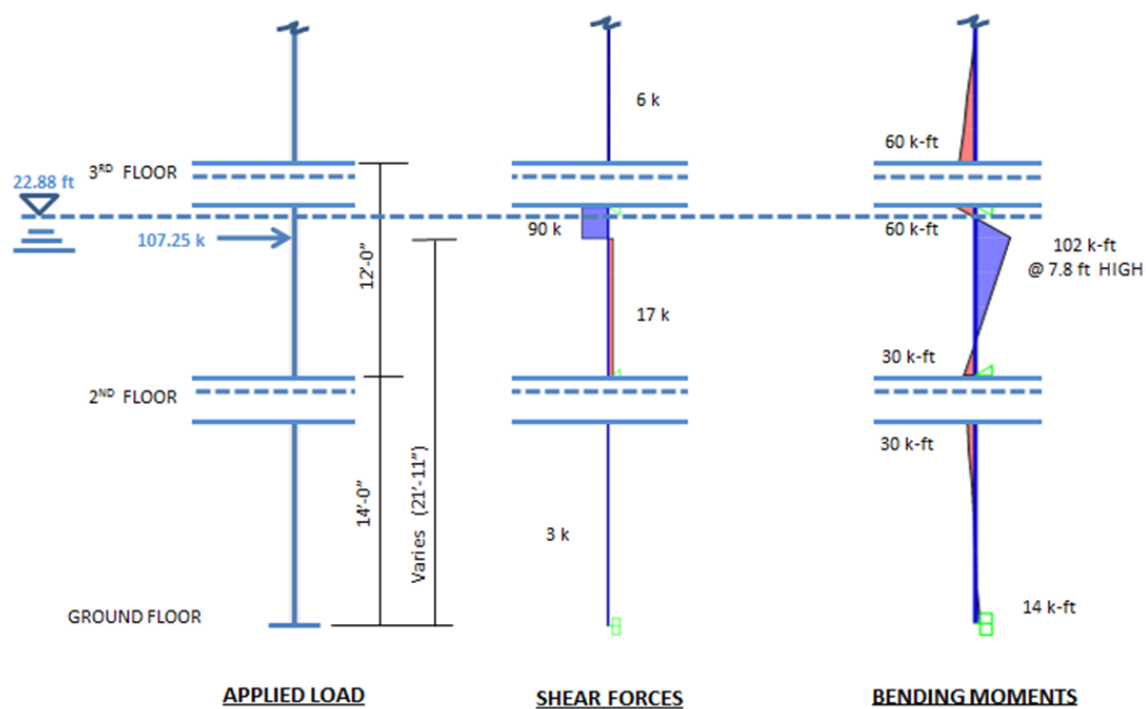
Impact load applied at "d" away from the end of column on the 2nd floor
